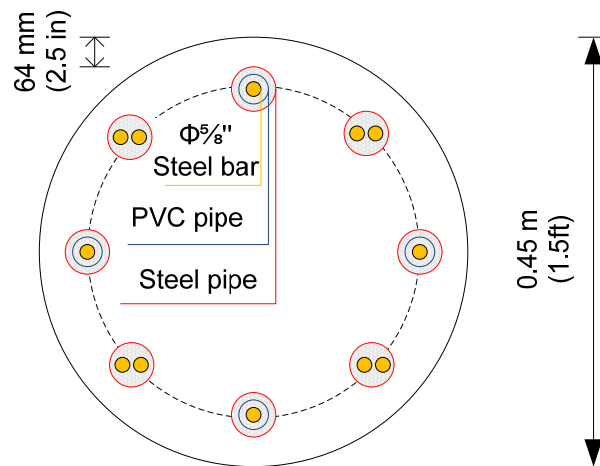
Schematic of the Pile Foundation (Bottom View).
